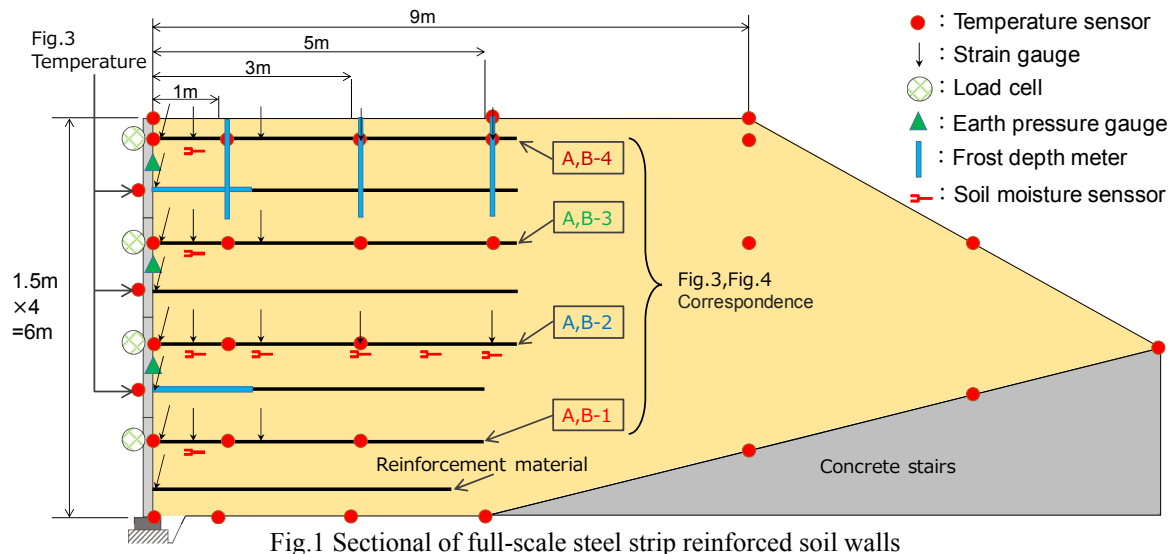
Sectional of full-scale steel strip reinforced soil walls
